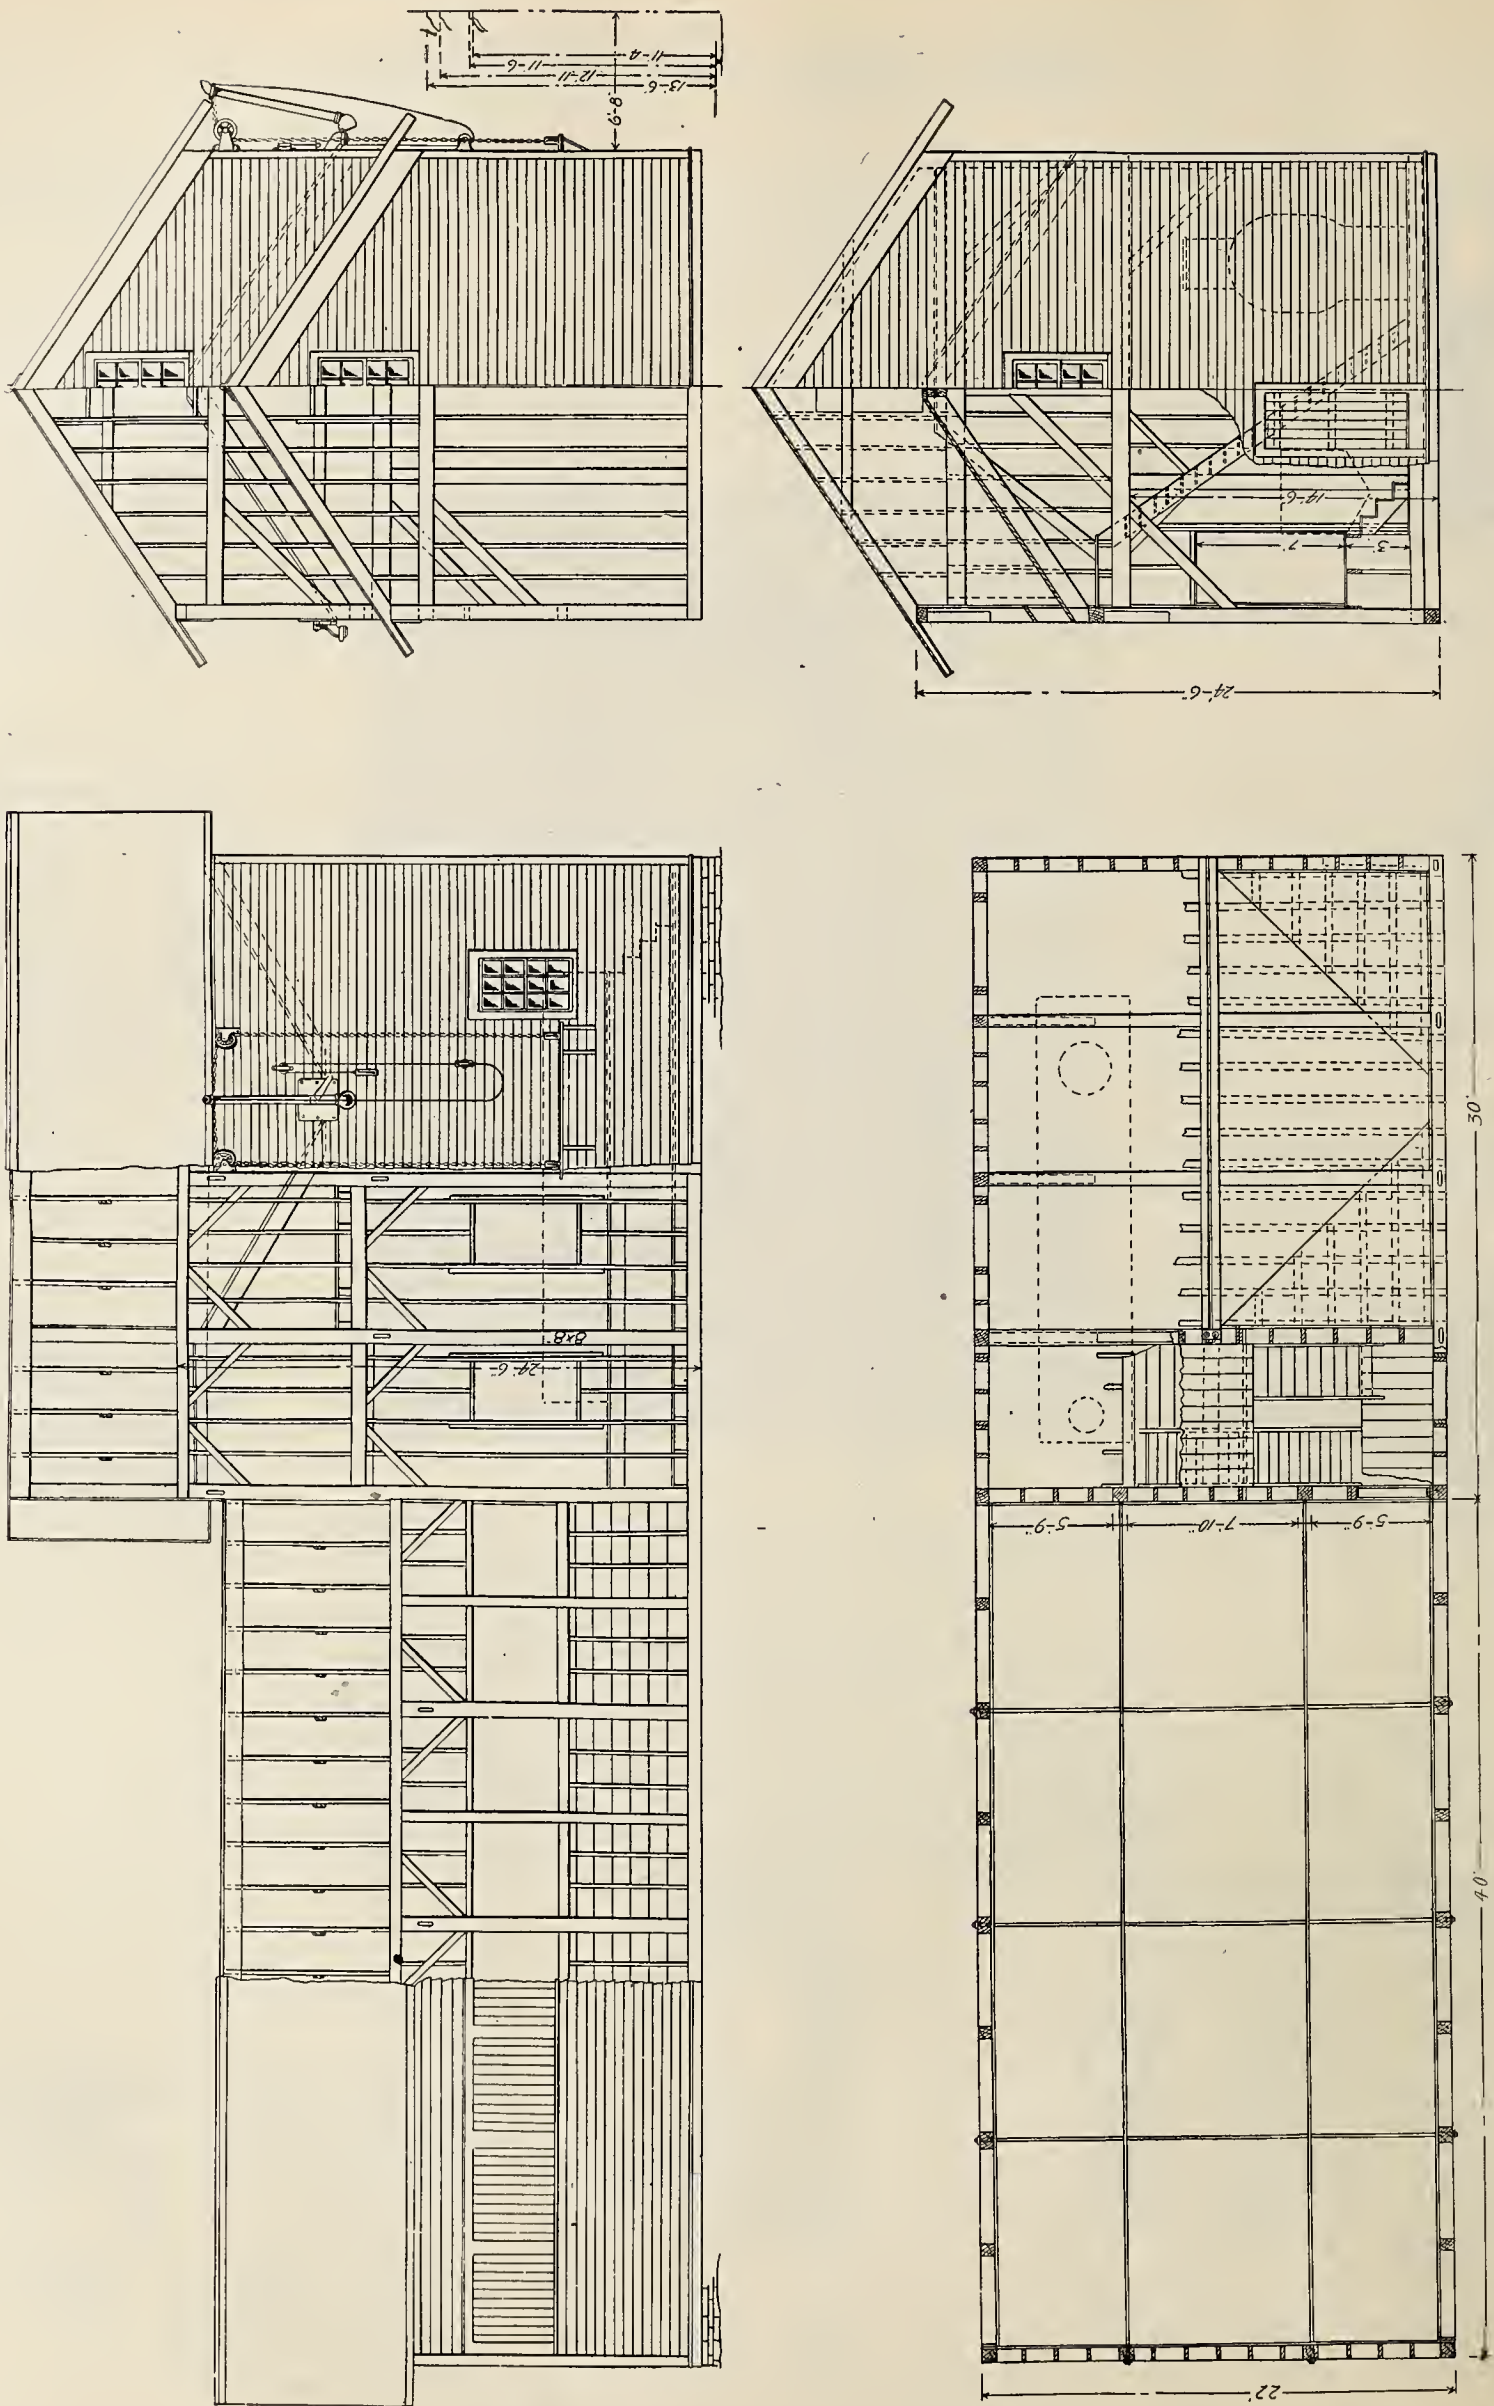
ERIE RAILROAD ARRANGEMENT OF SAND HOUSE.
